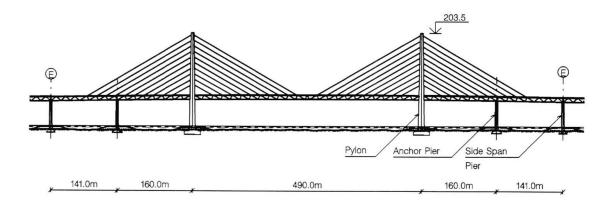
Öresund Link, Cable Stayed Bridge. Side view.
